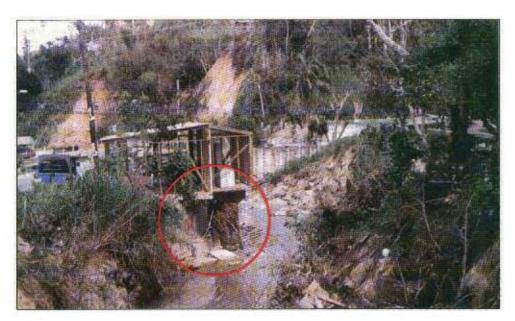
Typical construction adjacent to and over the river. Note the debris trapped under the concrete foundation and between the framing.
